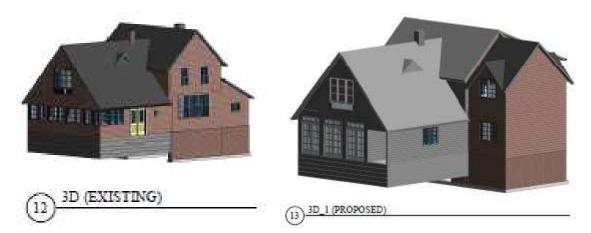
Drawings of existing and proposed front and east façades, 869 Sangster Avenue. (images from owners.)
